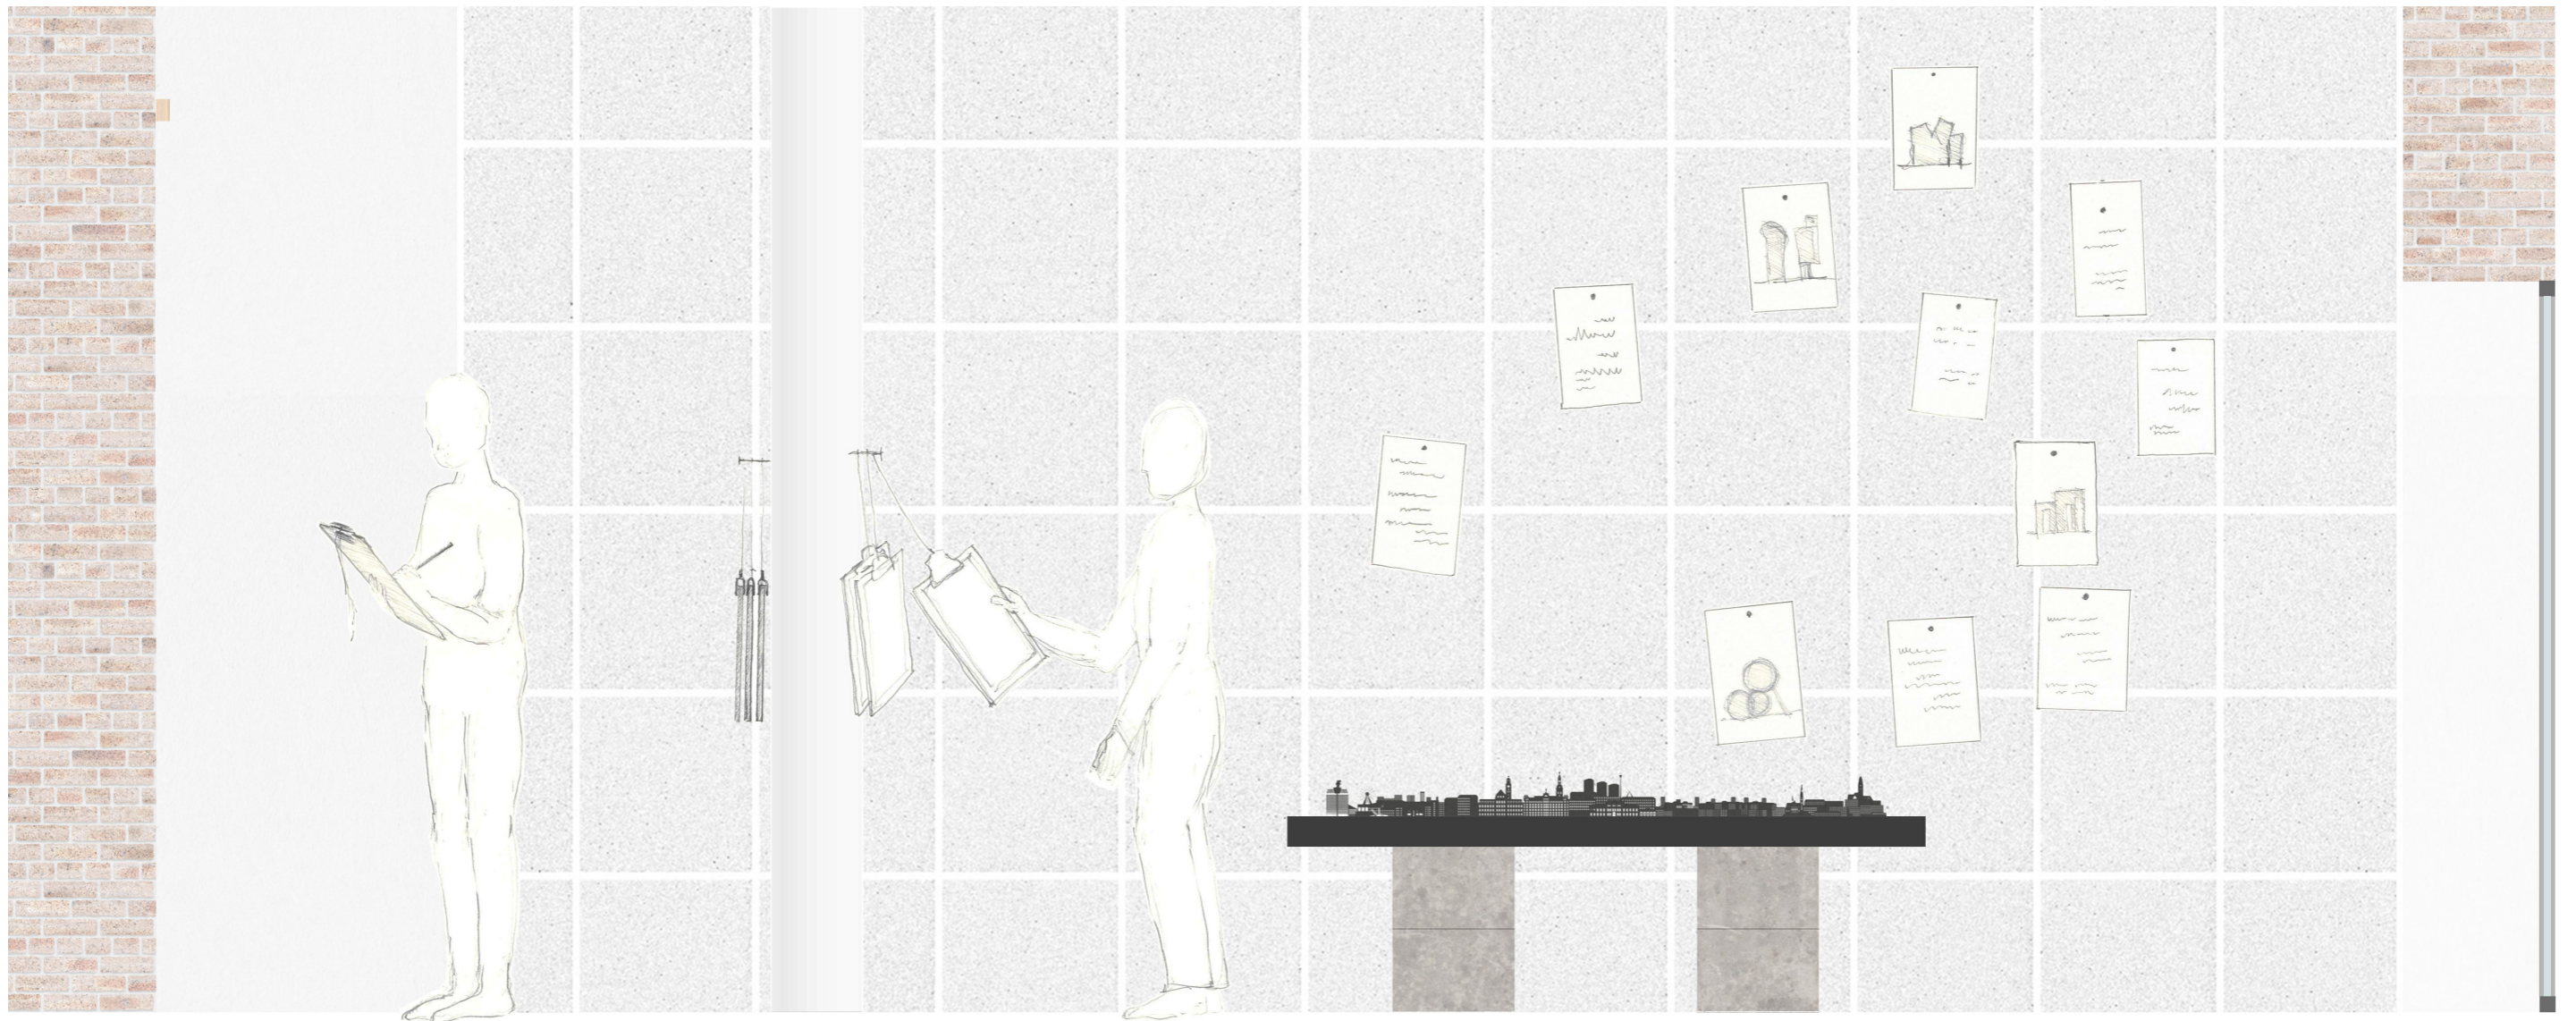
Elevation showing situation in the first room. Scale 1:20
